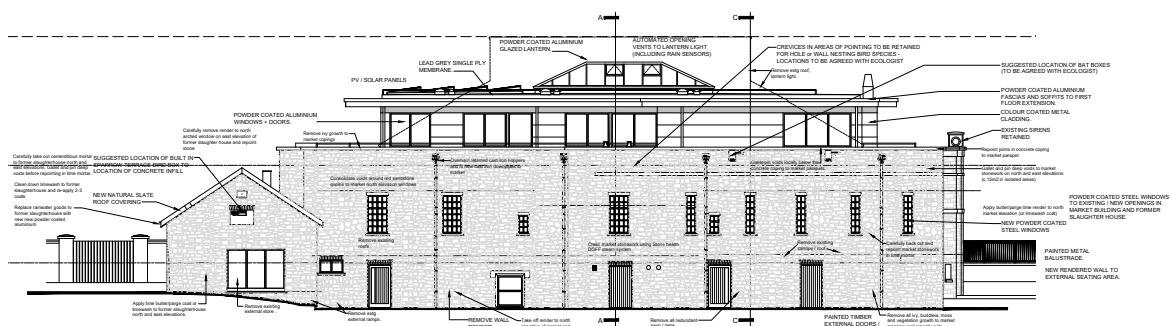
above: Proposed north east elevation - source Pembroke Design Ltd illustrating omission of door at lower ground level with window replaced and addition of door vision panel, hoppers to glazed roof added, photovoltaic panels, rooftop vents, sunpipes and new openings to rooftop extension, wall grills to central area of lower ground floor
